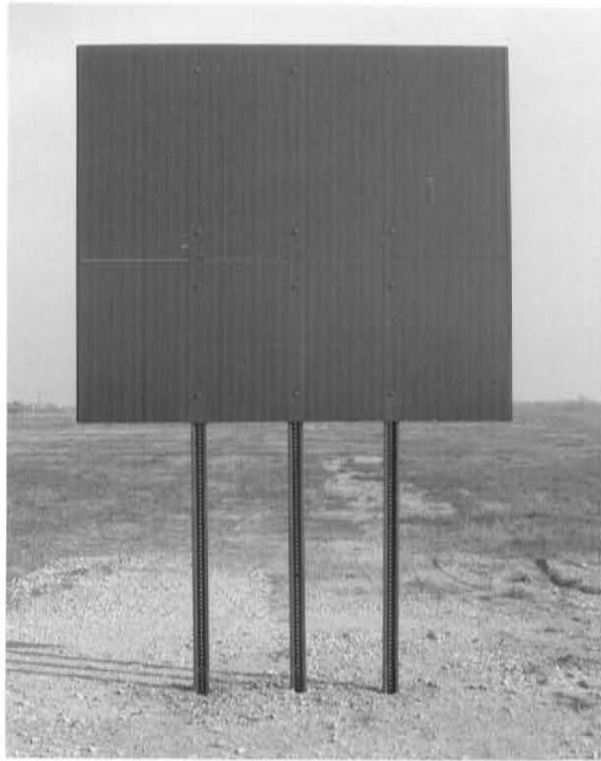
SIGN INSTALLATION USED IN TEST 7024-24.
